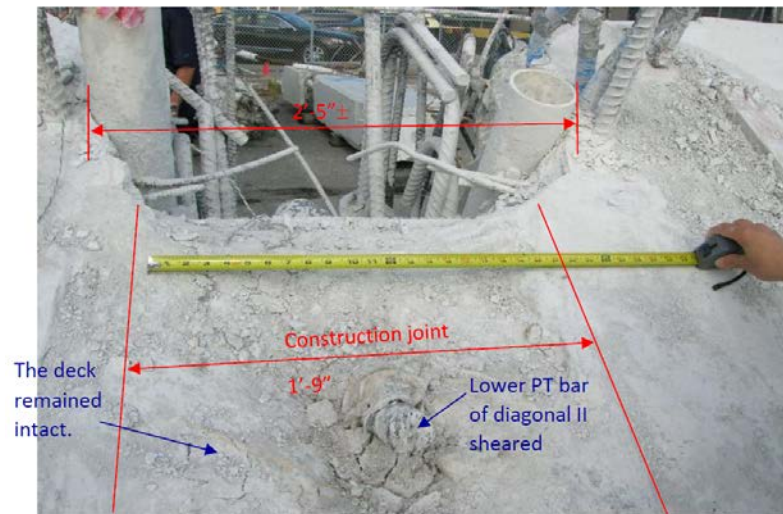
Post-collapse image of the joint between Node 11/12 and the Deck.¹⁰³
